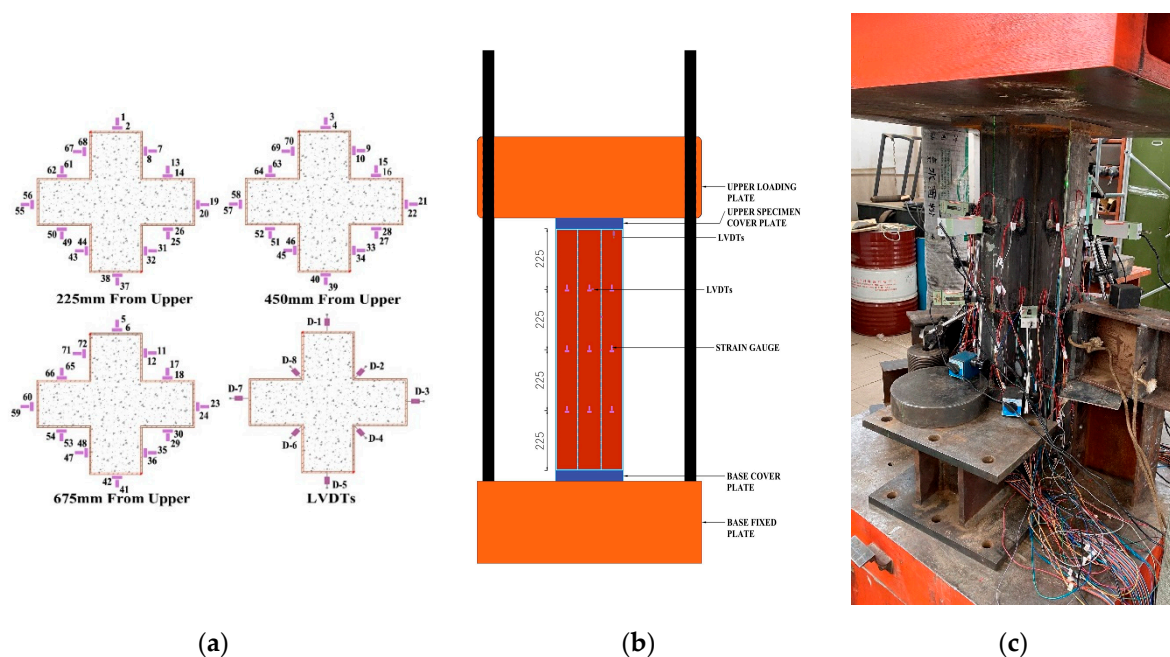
Test setup of cross-shaped CFST and ST columns: (a) Measuring instrument setting; (b) Loading simple diagram; (c) Loading machine setup.
